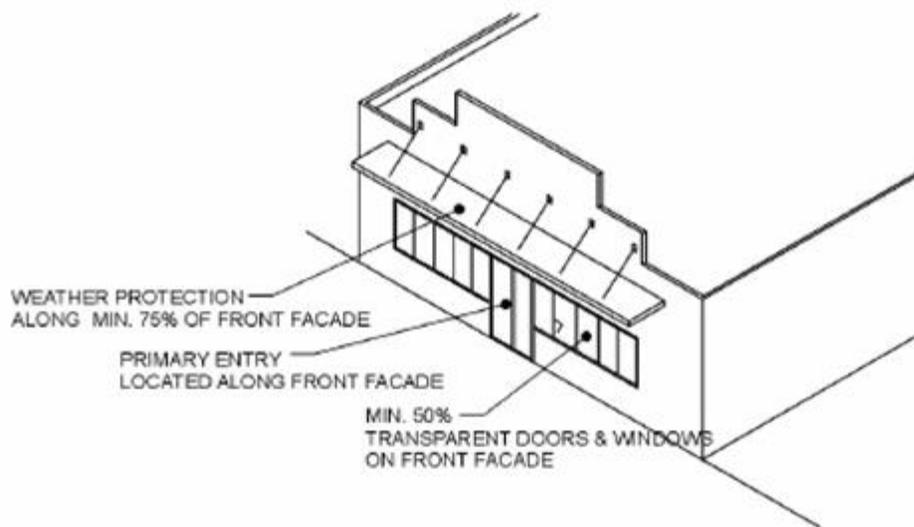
Illustrating one-way new development could meet the site design and pedestrian and vehicular access standards. Reserved.
